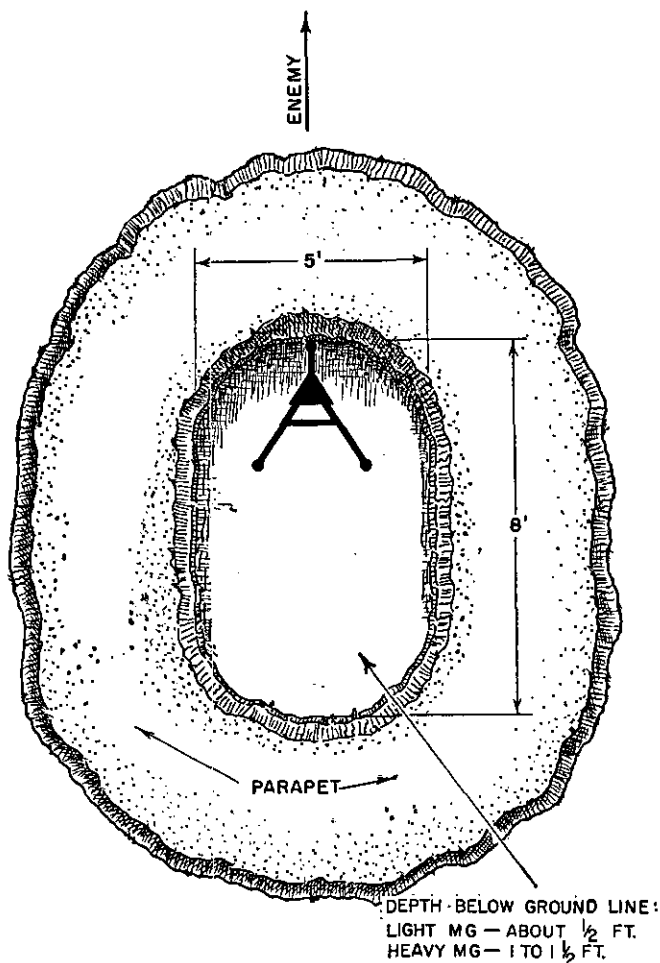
Initial stage in horseshoe type emplacement for caliber .30 machine gun (light or heavy). (Camouflage omitted.)
